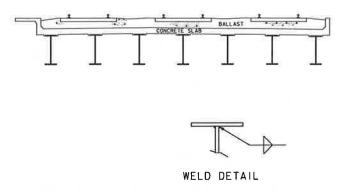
Section through ballast deck bridge and weld detail.
